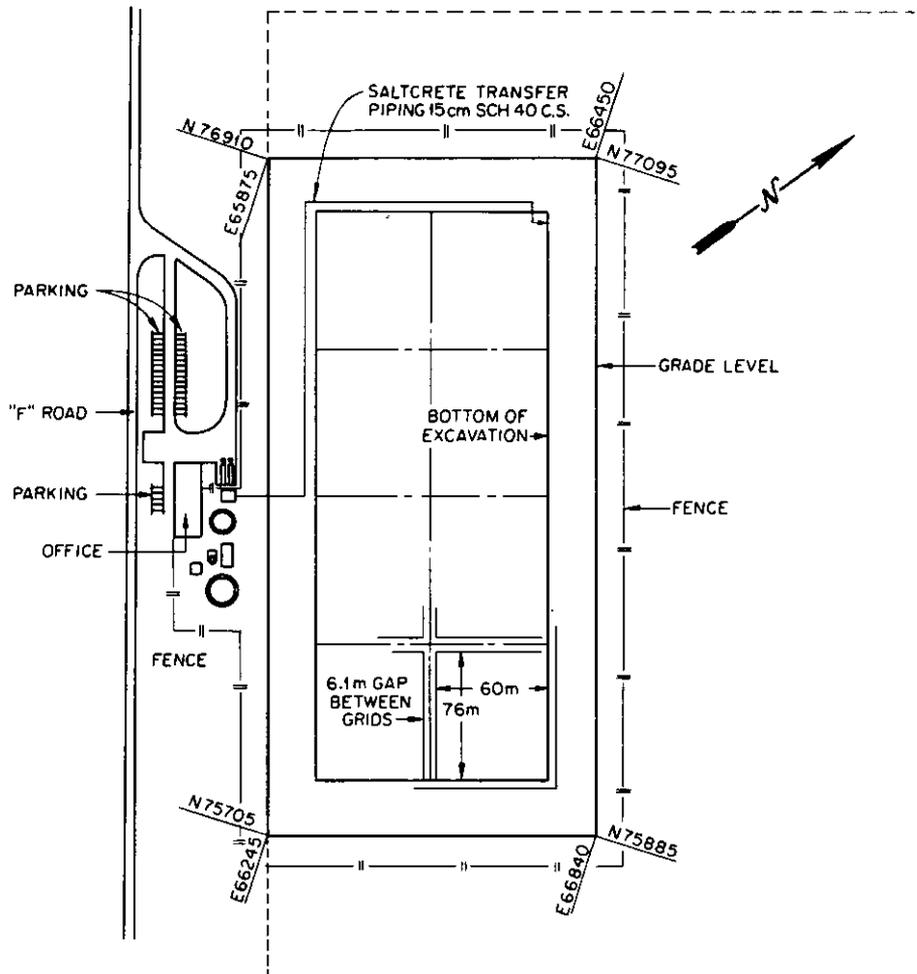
Plot plan of the 200-Z area for saltcrete burial. Source: EID, Sect. 3.
